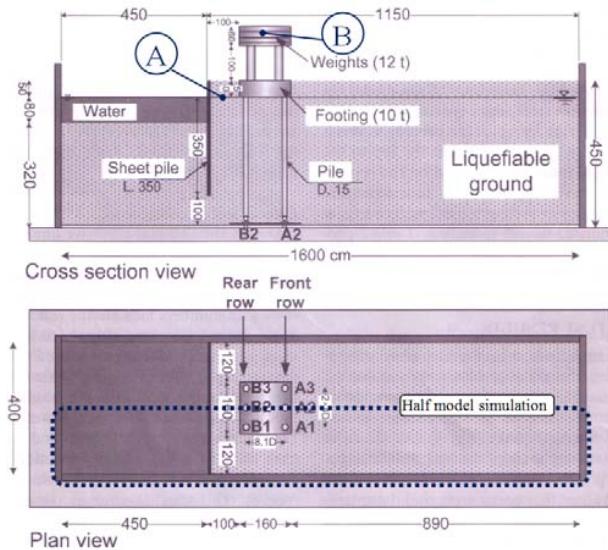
Cross section and plane views of 2x3 pile group and sheet pile quay wall-large scale test in E-Defense (unit: cm) [5]
